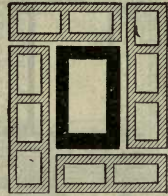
Rectangular Terra-Cotta Column Protection.
